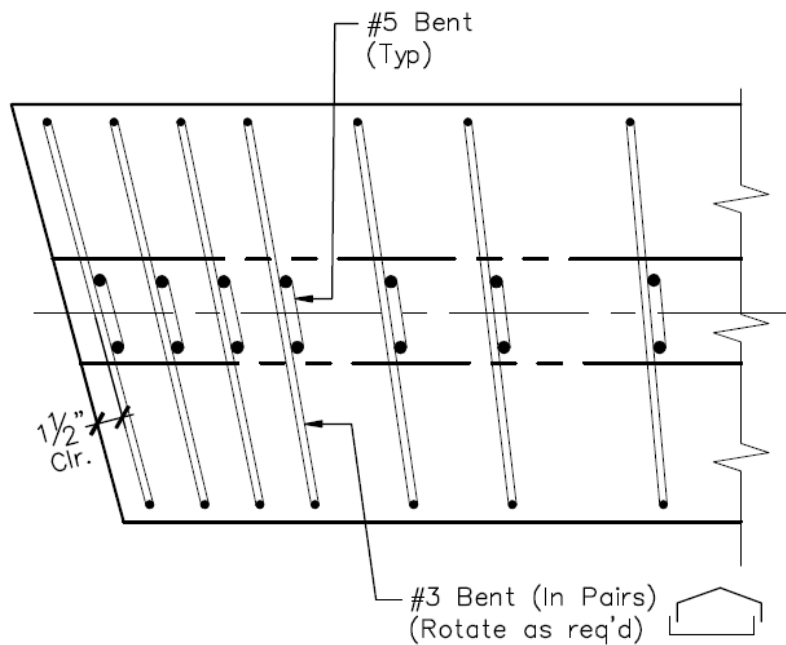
Typical bulb reinforcement near end of girder – plan view.
